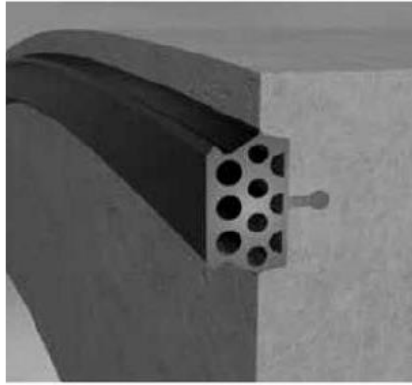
Seal Trelleborg, with a only anchorage to the concrete
